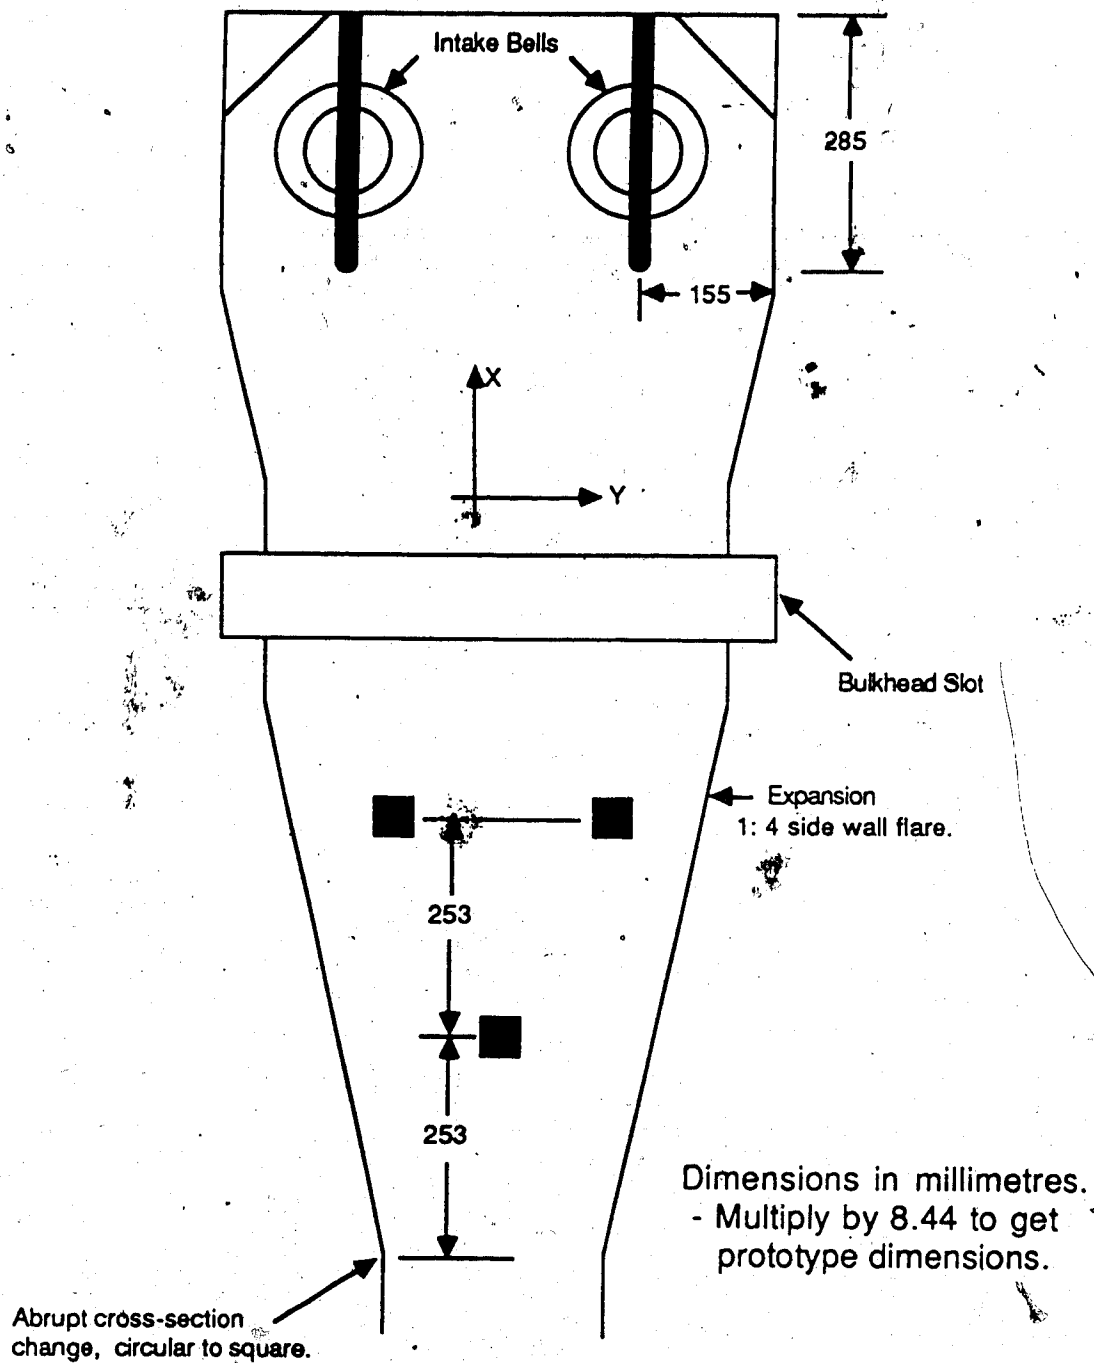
Plan view of improved sump showing dimensions of the improvements.
